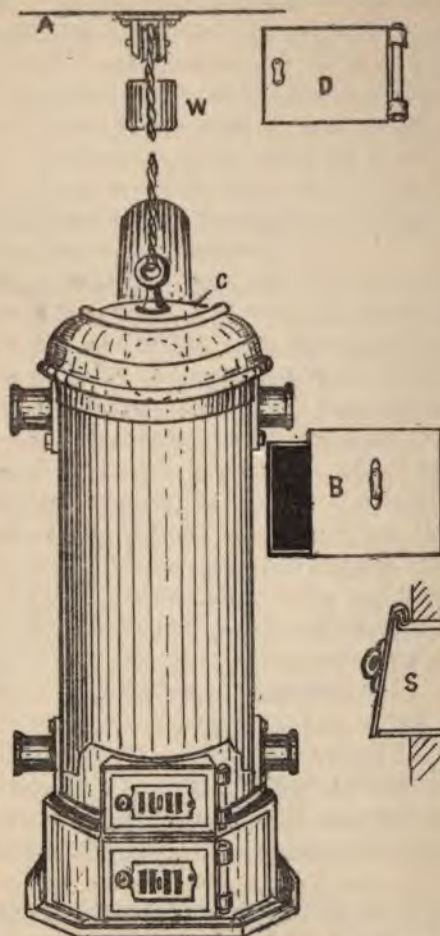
Boiler and Furnace with Flue Arrangement.
